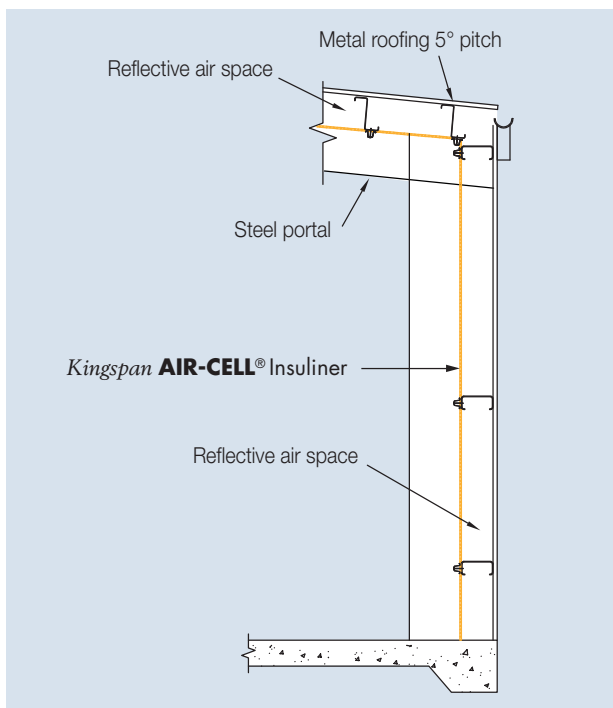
Side elevation of Kingspan AIR-CELL Insuliner® in a warehouse wall retrofit
